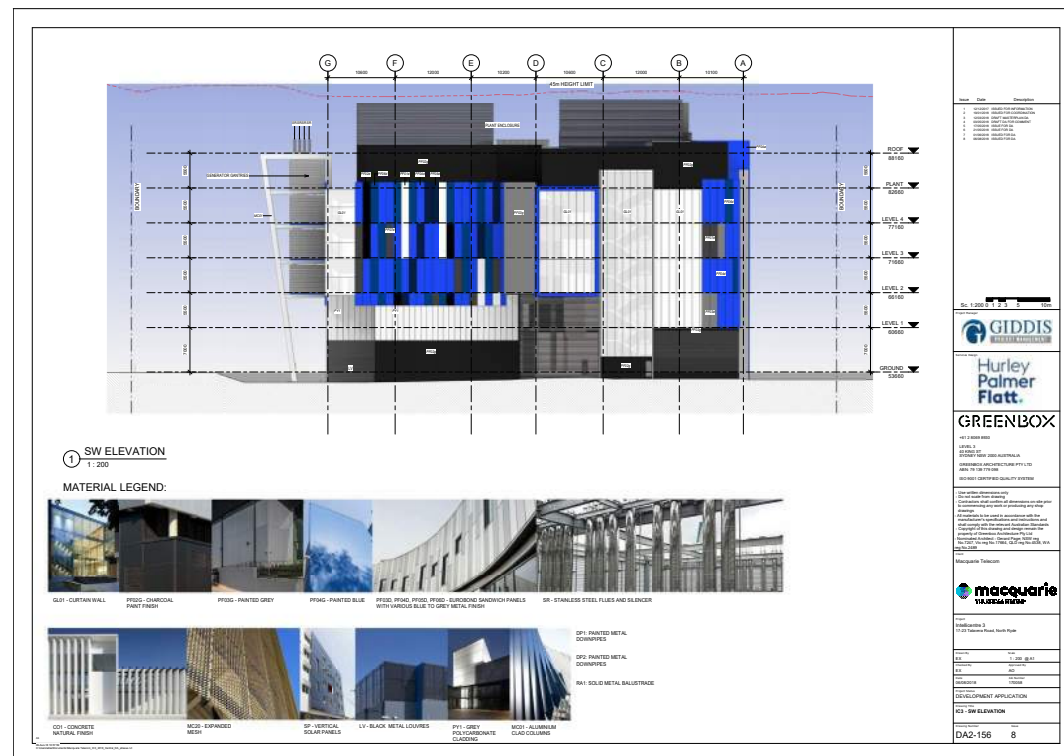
DA Approved IC3W - SW Elevation (Source: Greenbox)
